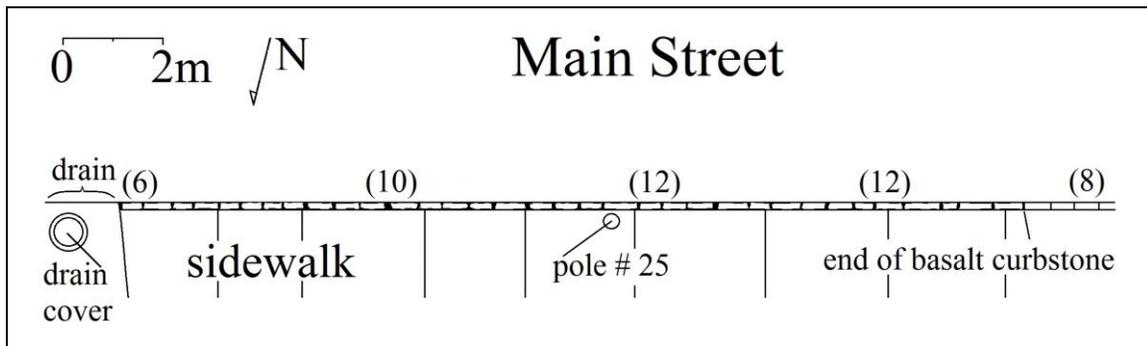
Site 6442 basalt curbstones on Main Street near Market Street intersection.
